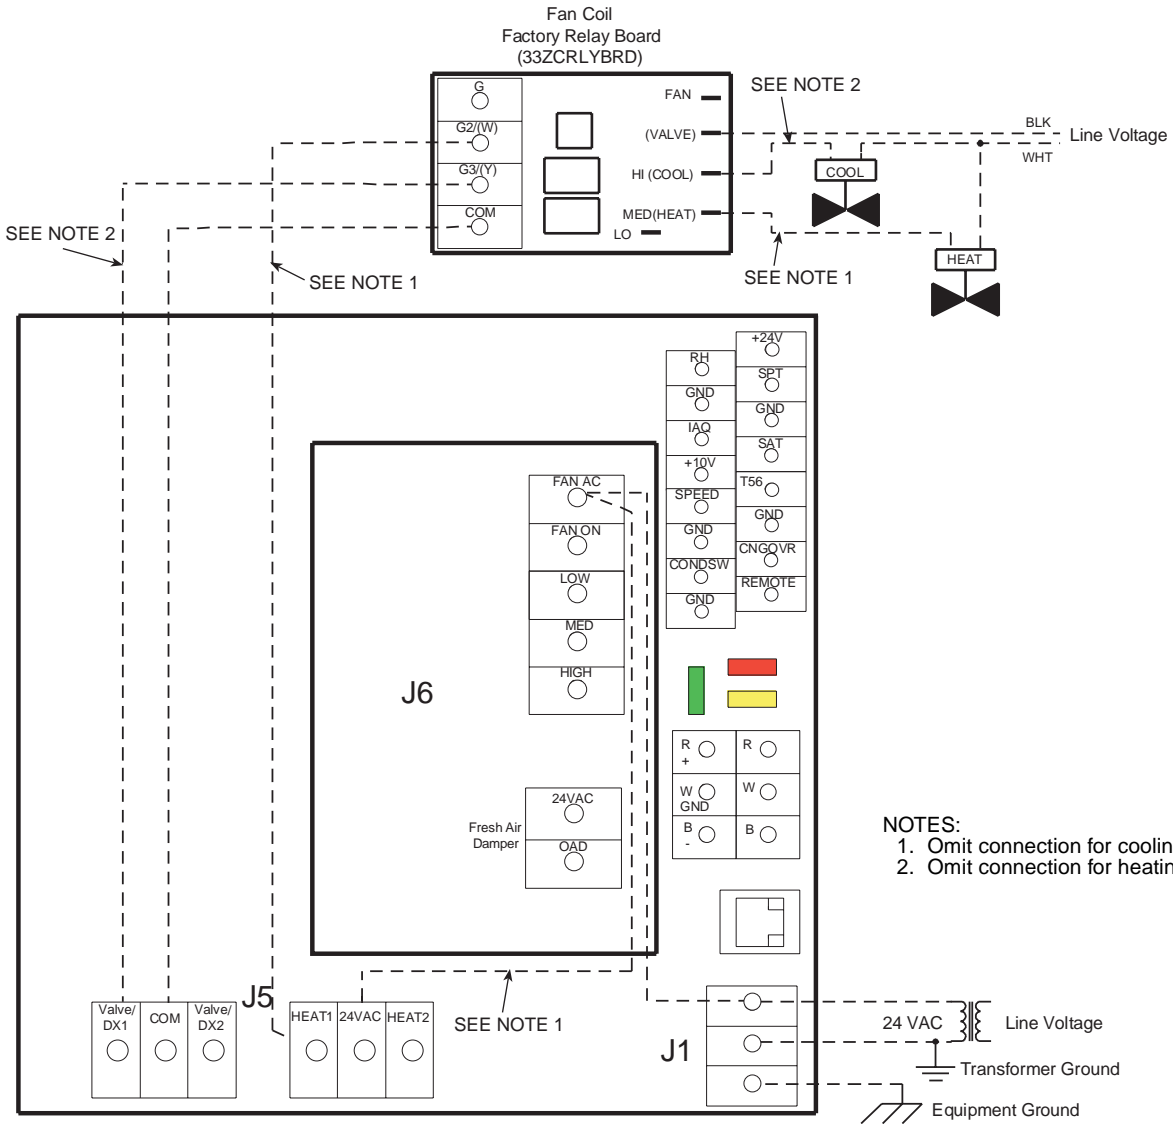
Fan Coil Relay Board Wiring — 4-Pipe Water Valve Application
